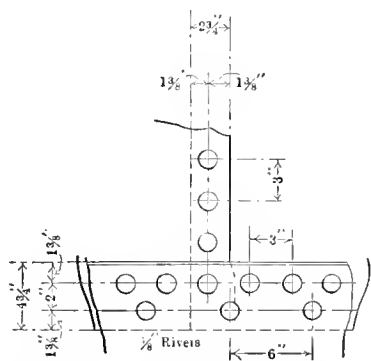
DETAIL OF RIVETING ABOVE 25 FEET.
